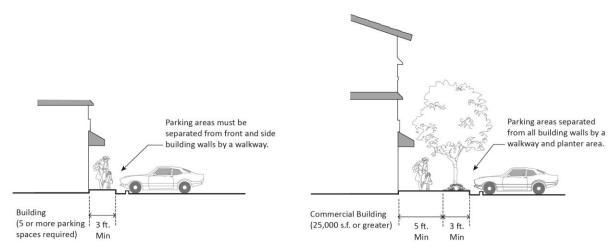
K: PARKING SEPARATION FROM ON-SITE BUILDINGS
